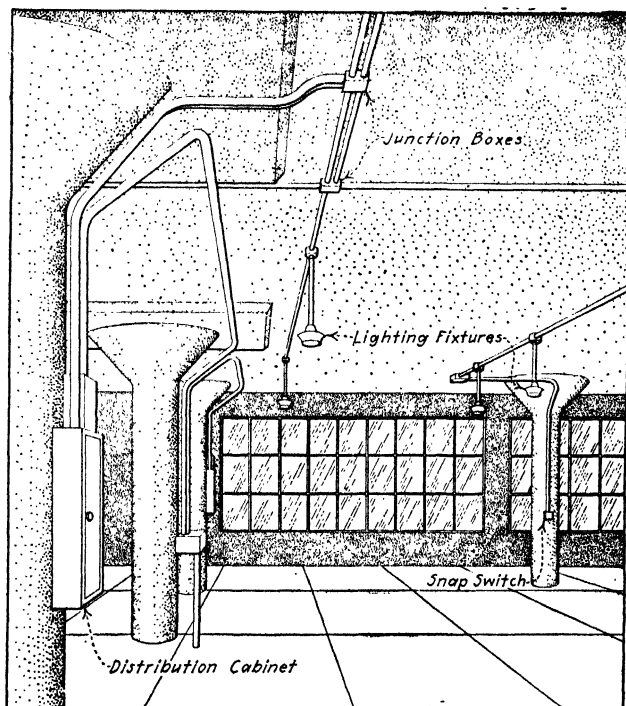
Another example of exposed surface conduit wiring. Note the manner in which the conduit runs enter and leave the panel boxes on the columns and the extensive use of junction boxes.
